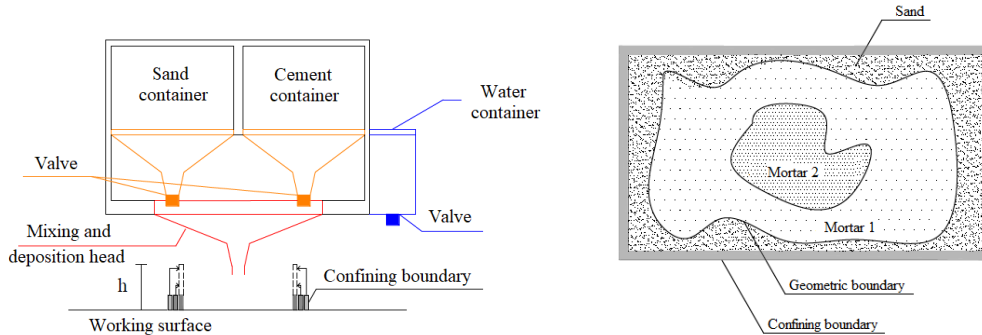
The basic concept of the proposed 3D printing process: cross-sectional view (left); plan view of resulting printing (right). Adapted from [9]
